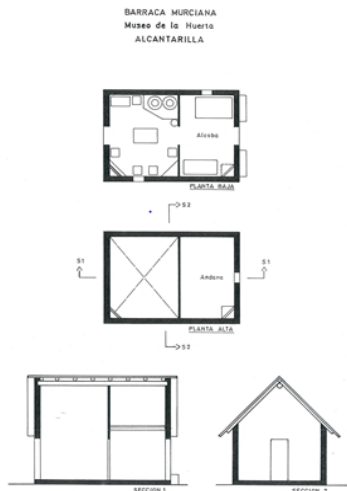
Plans and sections of the Murcian hut. Source: authors' own elaboration.
